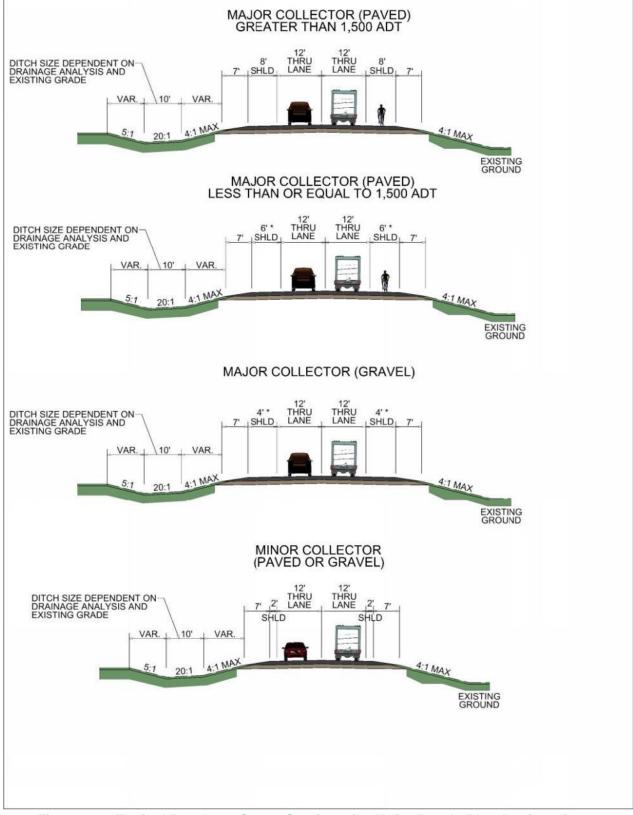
Typical Roadway Cross-Sections for Major Roads Plan Designations
